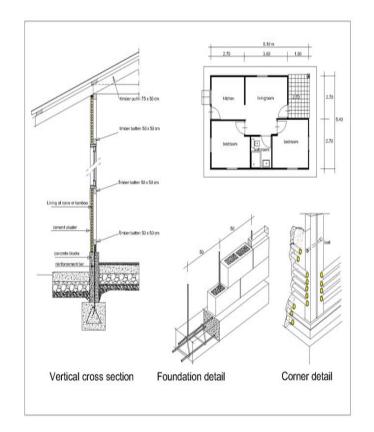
Floor Plan and Technical Drawings of a Basic Prefab Bamboo House. Source: Vries (2002) A 40 m² house (as in Figure 6) built with the prefab bamboo construction technology needs about 15 panels. The system allows all kinds of adaptations of the size and sub-division of spaces as required. Compared to the CB and Prefab Concrete Panel technologies, the Prefab Bamboo technology is rather flexible and easier to handle (manually) on site. The CB technology is most labour intensive. Although the Prefab Bamboo technology requires preservation against fungi, termites, insects, etc. as well as protection against fire risk, it scores better in an ecological sense as well as in technical durability against wind loads and seismic forces compared to the concrete technologies as in Table 2.
